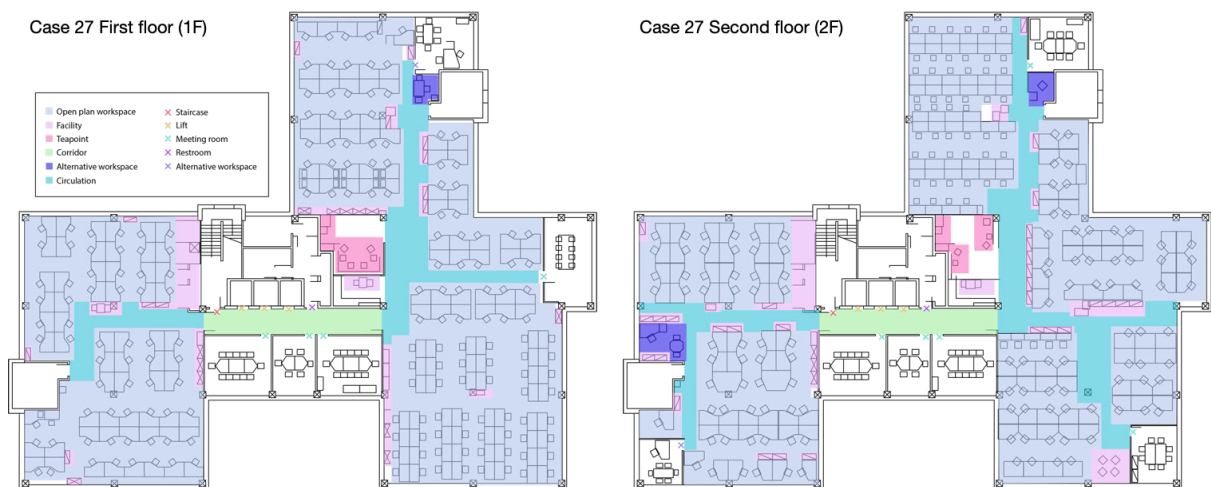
Floor plan with functions, Case 27 First floor (1F) and Second floor (2F) (adapted from ref. (31))
